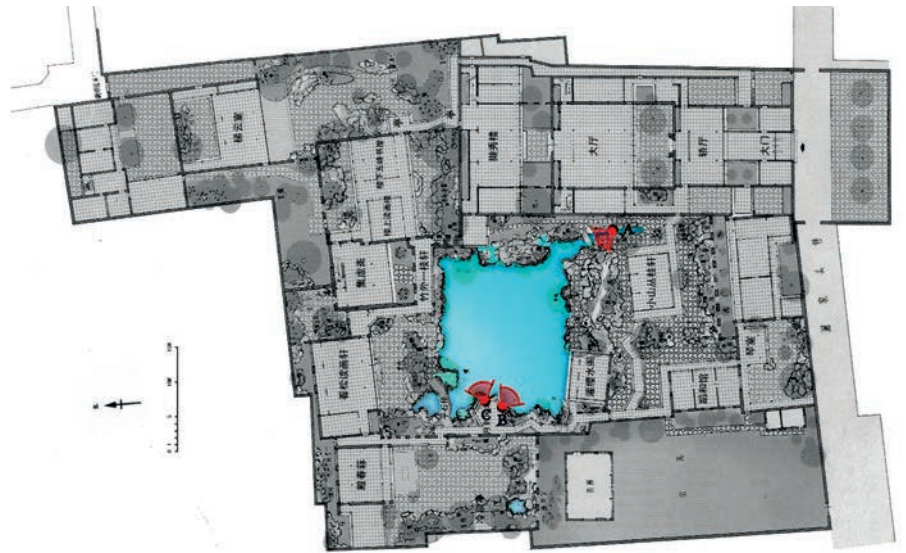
Plan View of the Master-of-Nets Garden [SuZhou Gardens 2008]
